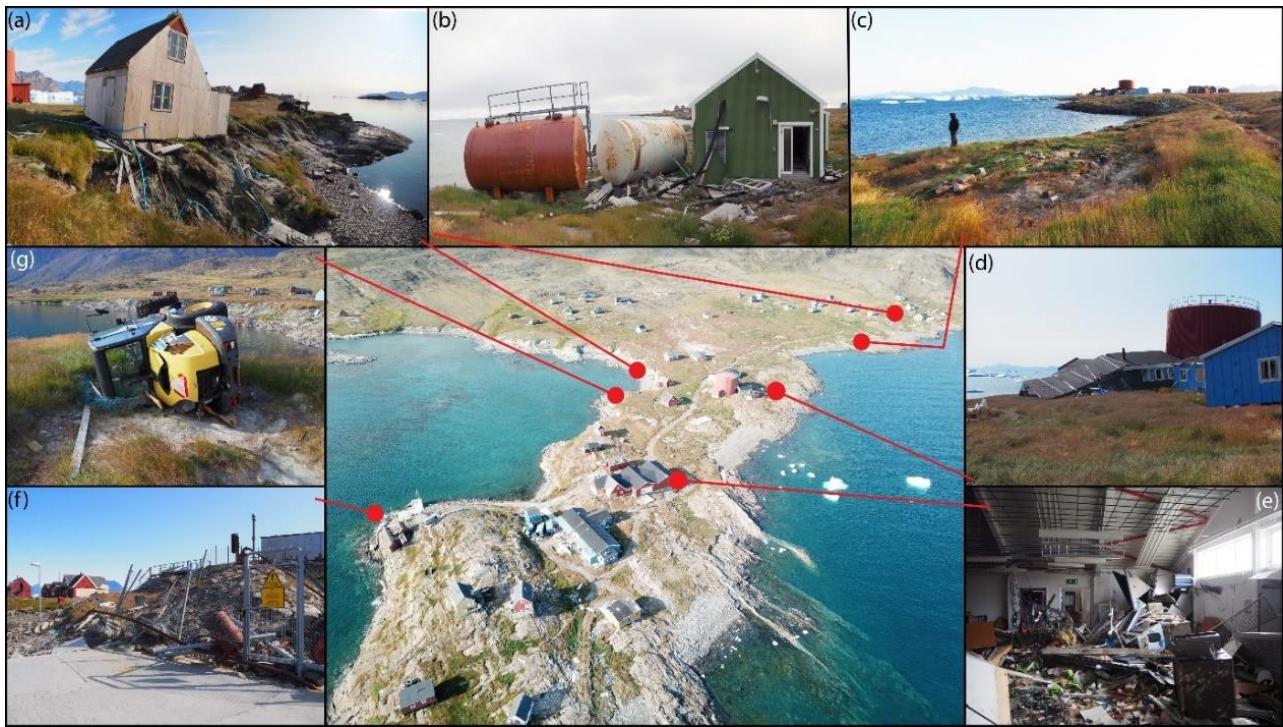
Examples of infrastructure damages caused by 2017 tsunami in Nuugaatsiaq. (a) Wooden house removed by wave from point foundation transported several dozen of meters; (b) Fuel tanks washed away from concrete frames and pushed towards power plant. Note large accumulation of litter and tsunami deposits around and inside the buildings; (c) site of former building position, which was destroyed and swept away by tsunami. Note broken wooden point foundations, media connections and erosional gullies; (d) Smashed and collapsed wooden school building moved towards major water tank; (e) Interior of local shopping centre passed by tsunami. Note large amounts of litter and rotting food supplies and twisted and bowed metal frame construction; (f) Partly-torn metal fence around fuel storage site which acted as a trap for litter transported by tsunami; (g) example of heavy machine knocked over by waves.
